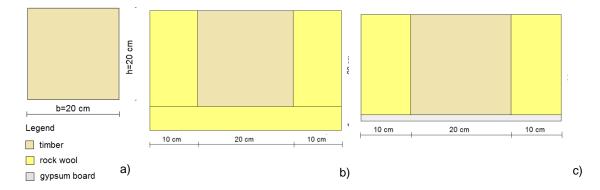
Cross sections of the beams, a) Case study 1, b) Case study 2, c) Case study 3
